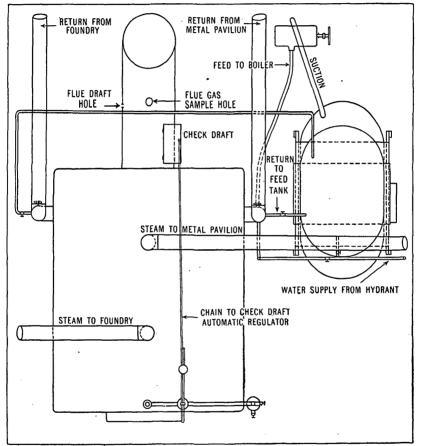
Plan of house-heating boiler plant at St. Louis, Mo.
